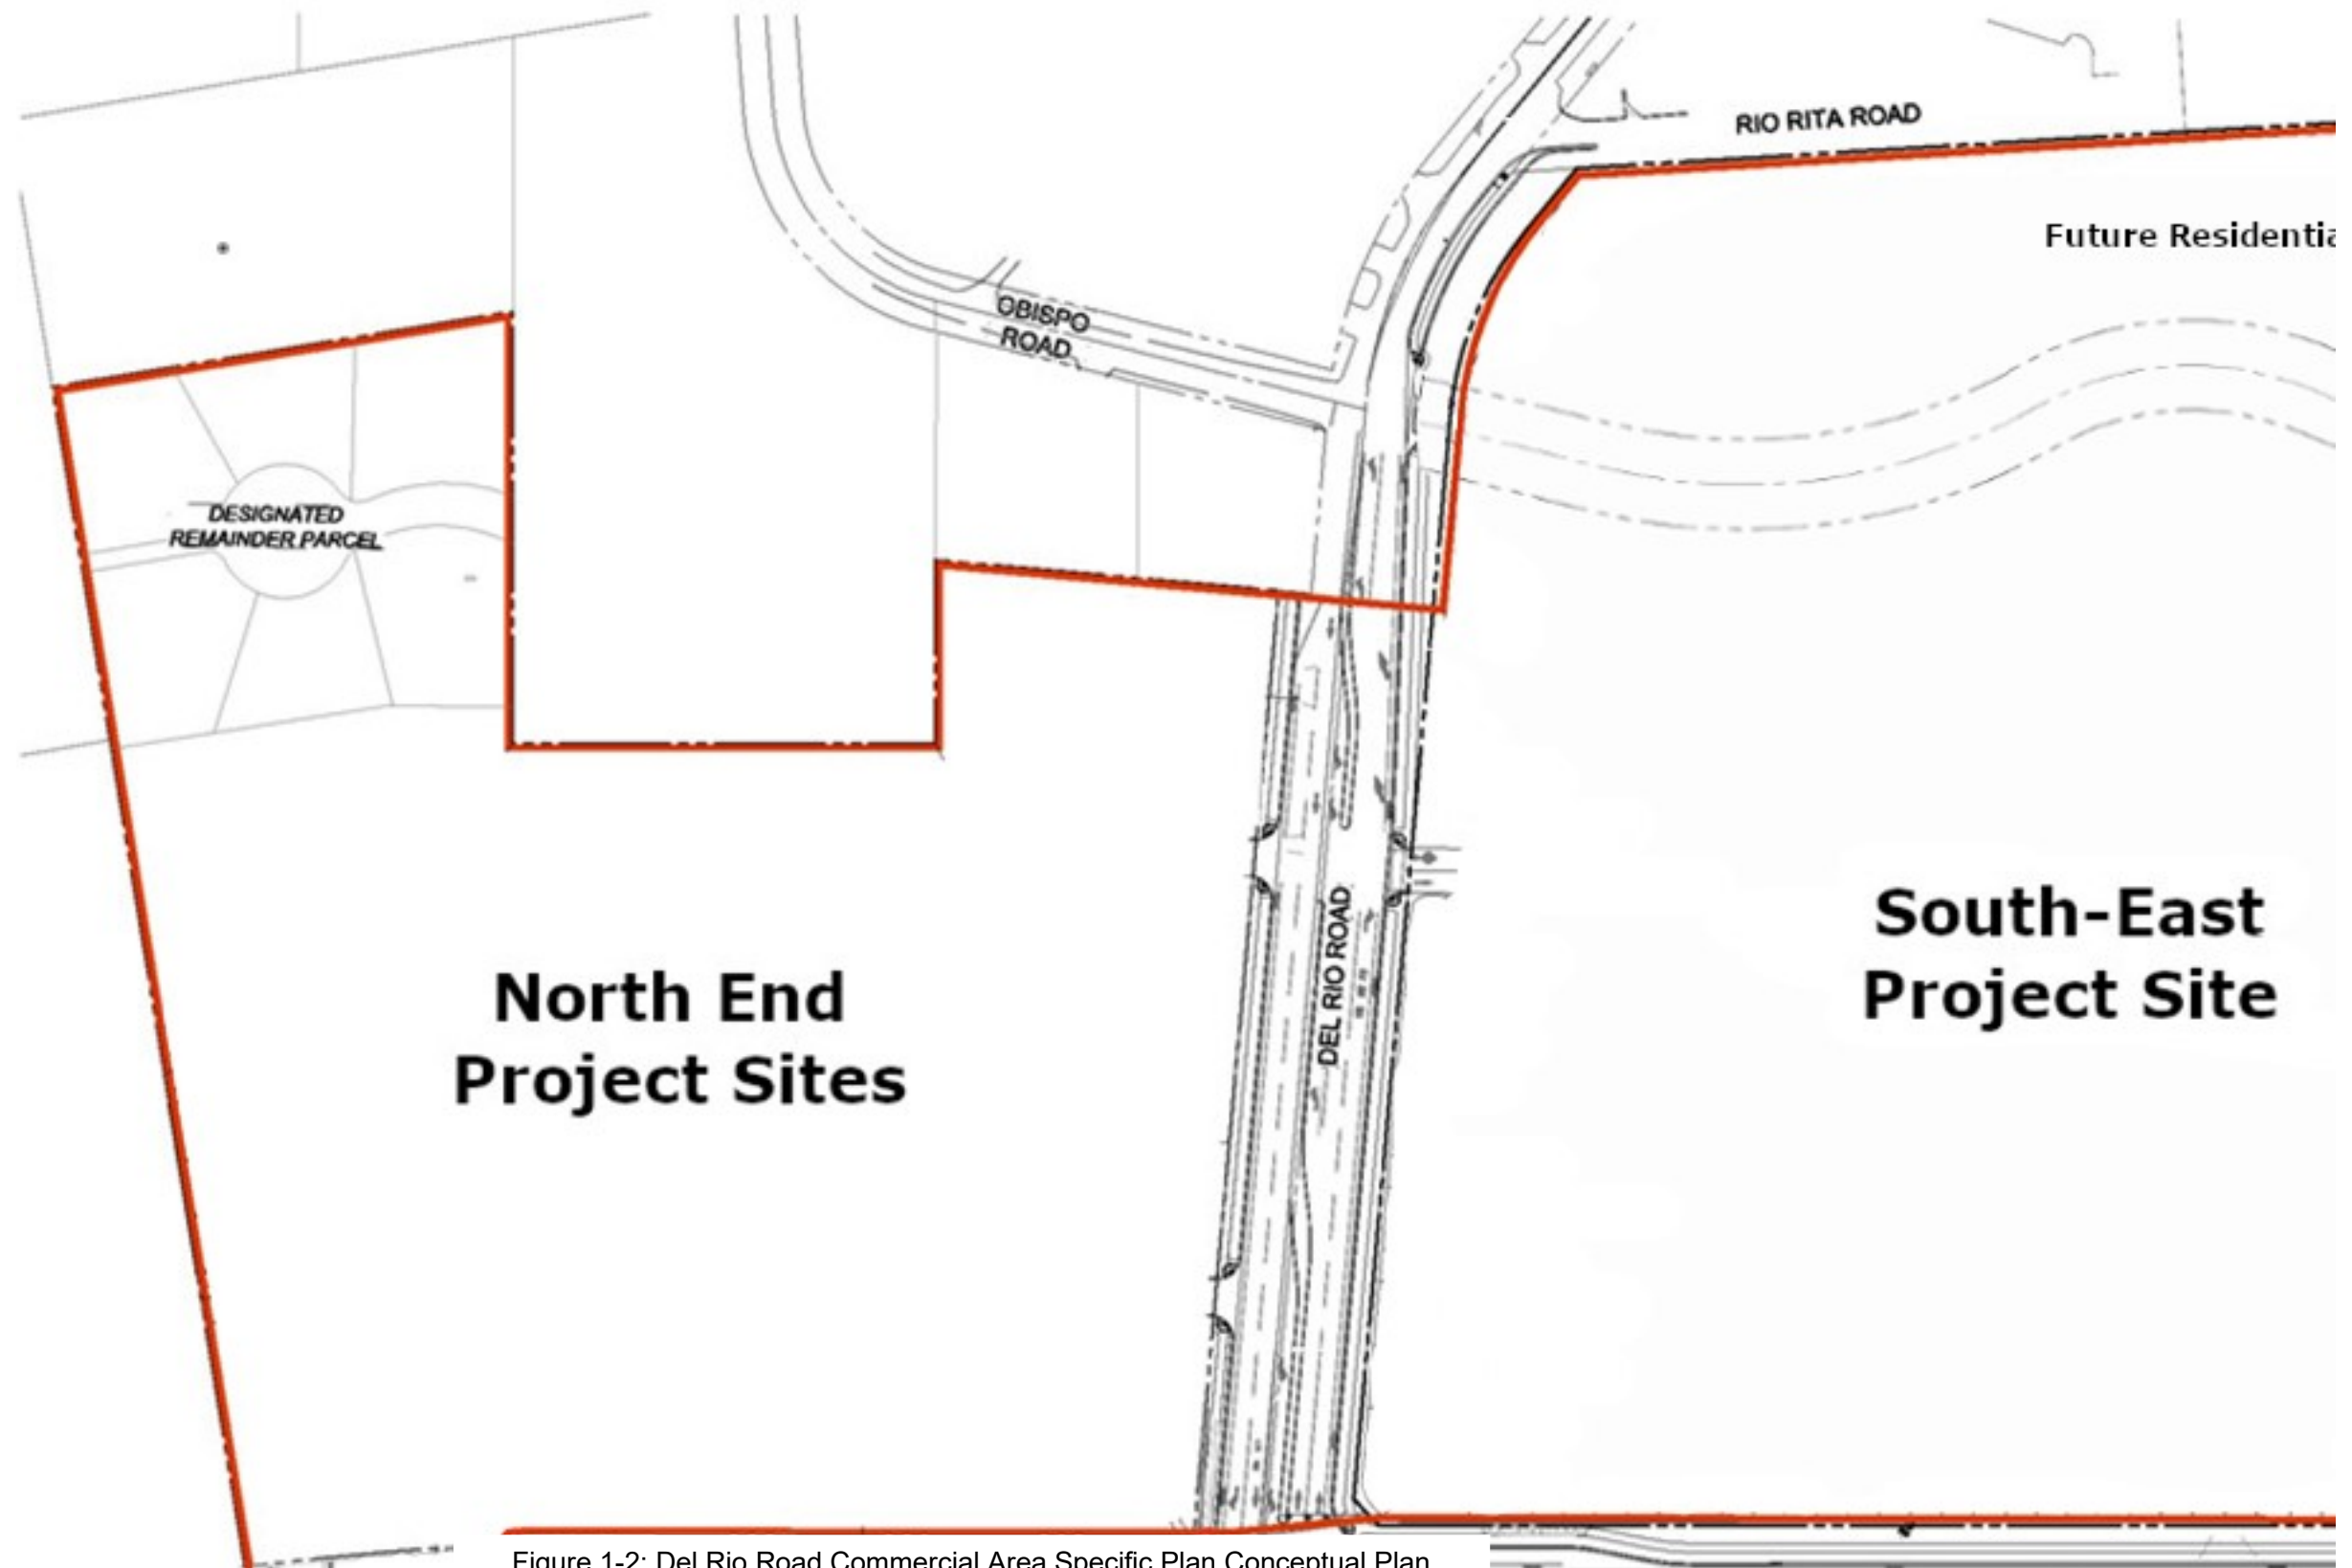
Del Rio Road Commercial Area Specific Plan Conceptual Plan
